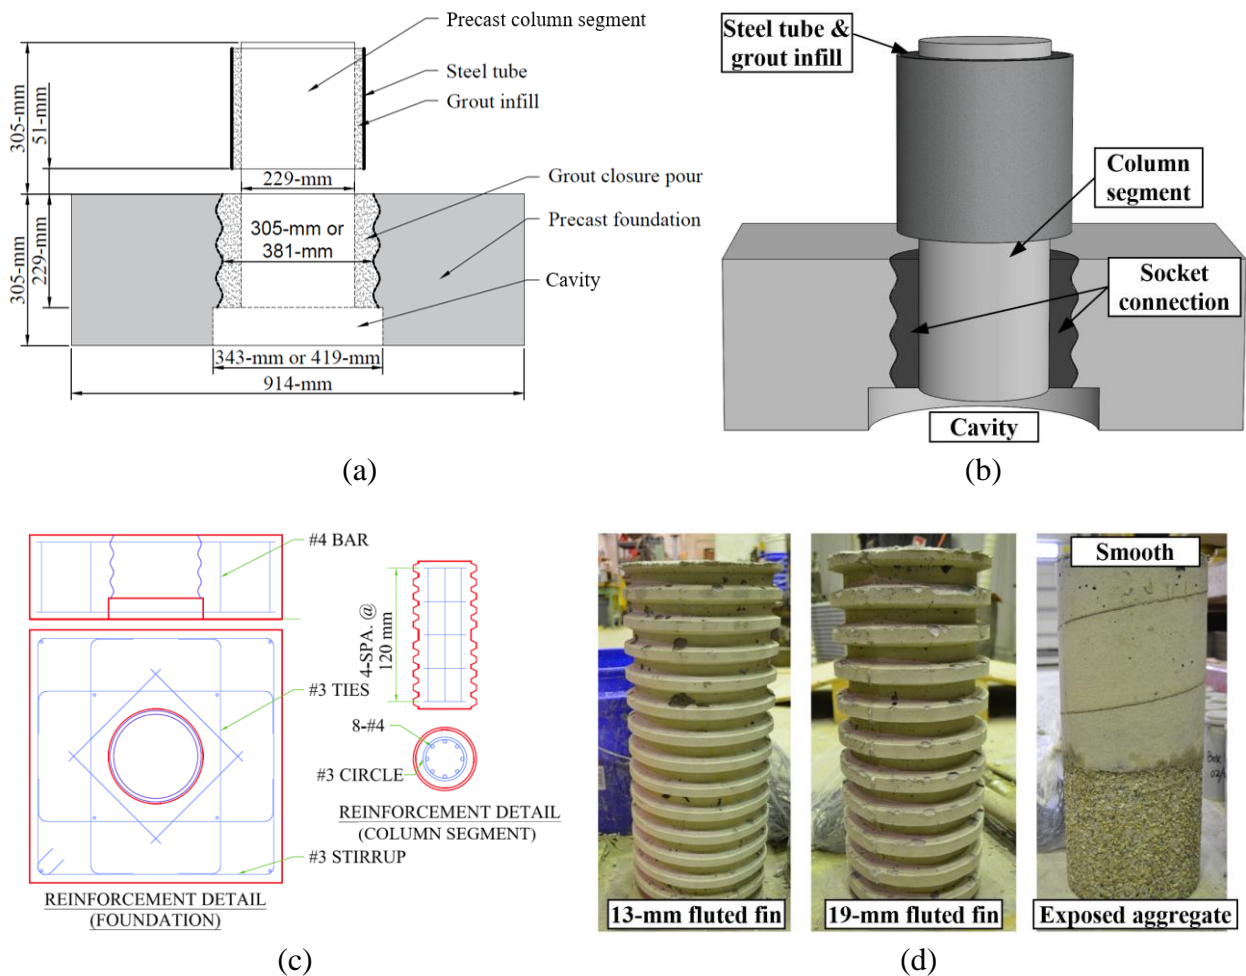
Details of specimens: (a) key dimensions; (b) oversized cavity; (c) reinforcement detail; (d) surface textures of precast column segments
